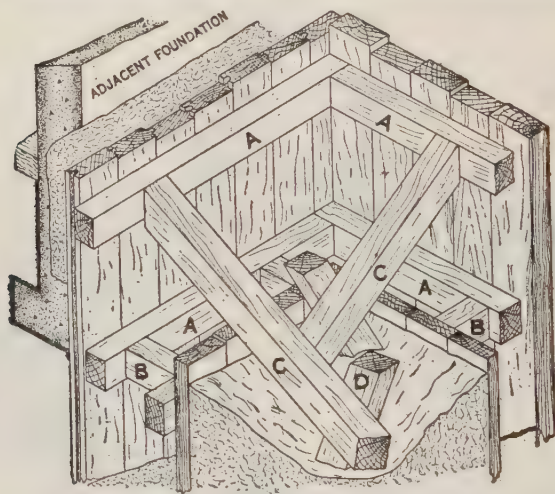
,764.—Detail of shoring showing method of construction when an excavation is to extend below an adjacent foundation or one near enough that might be endangered by it. When the excavation is made as deep as it is safe to, planks of a suitable size are sharpened on the bottom end and driven down behind walls AAAA; when wanted very tight they are tongued and grooved. Braces CC, are spiked to wales and to post anchors D, that are driven securely into the earth. When an inside row of planking is used to form trench, braces B, hold them a uniform distance apart. They are removed as the foundation rises.
